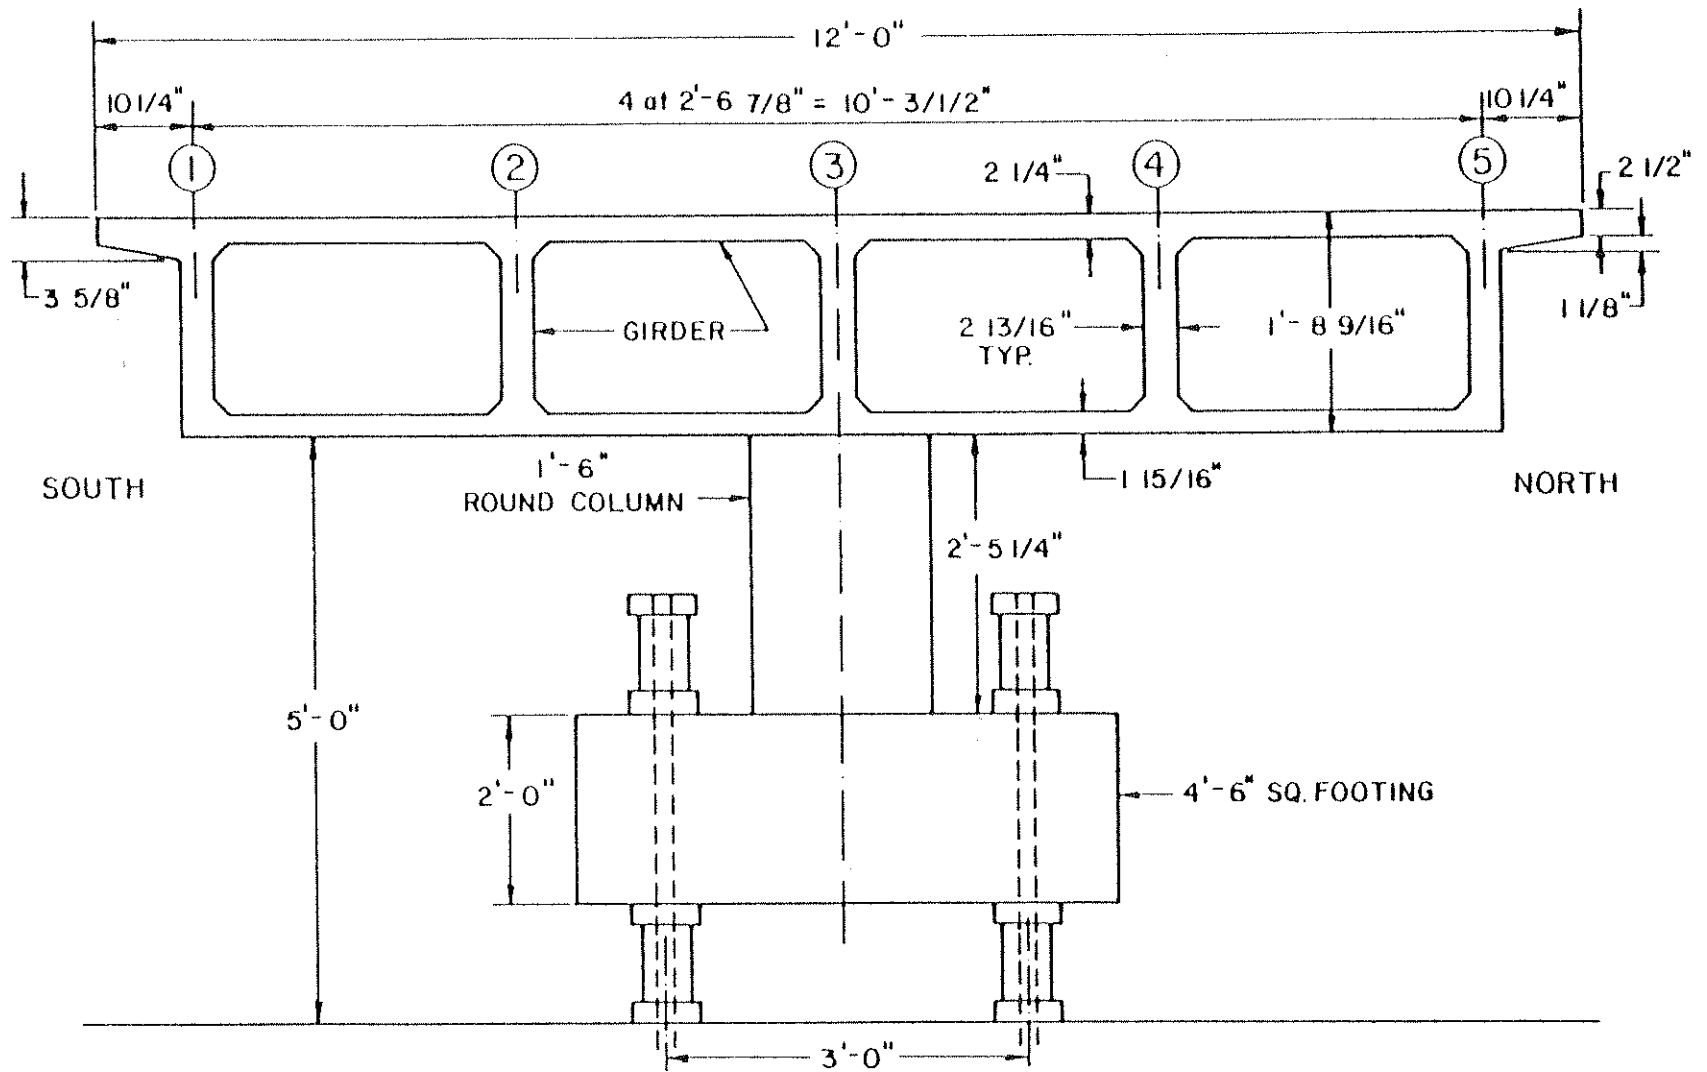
TYPICAL SECTION OF BOX GIRDER BRIDGE MODEL
